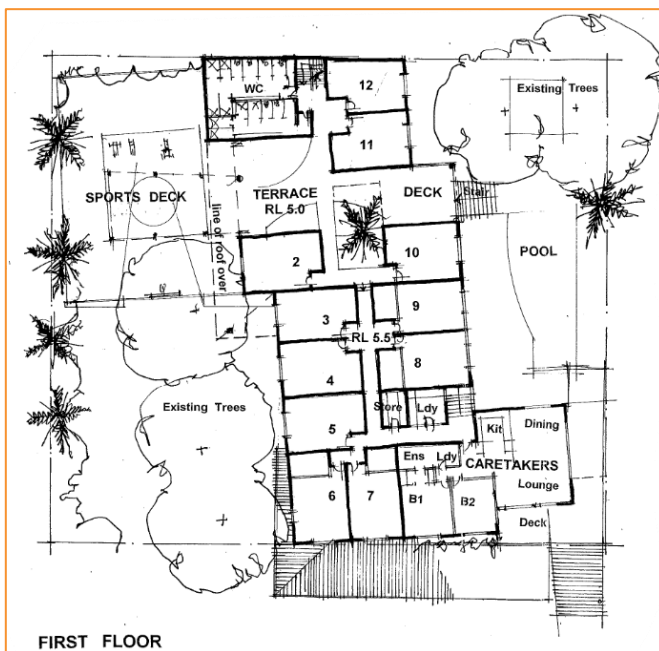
Extract of Existing Approved 1st Floor Source: Appeal No. 1 of 2001
